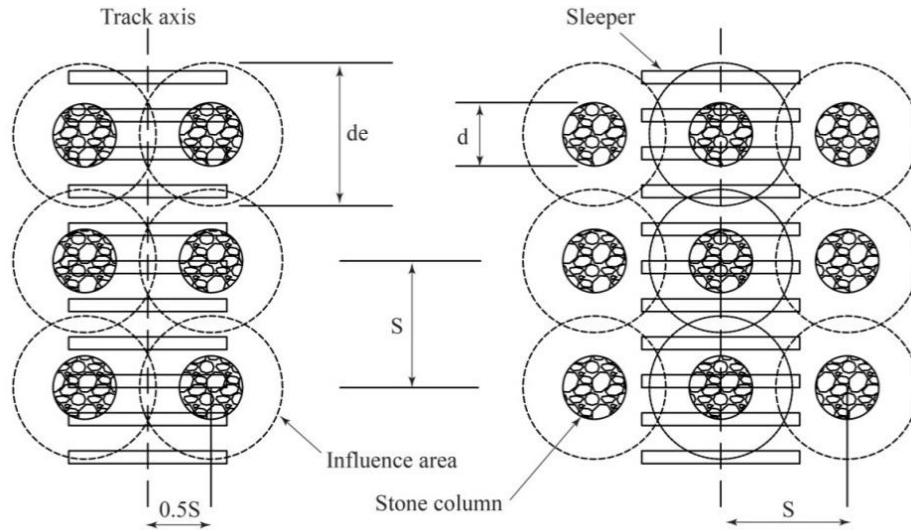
Arrangement of stone columns with regard to the track axis. Left, columns with offset from the axis (Arrangement 1); right, center of columns are aligned to the axis (Arrangement 2).
